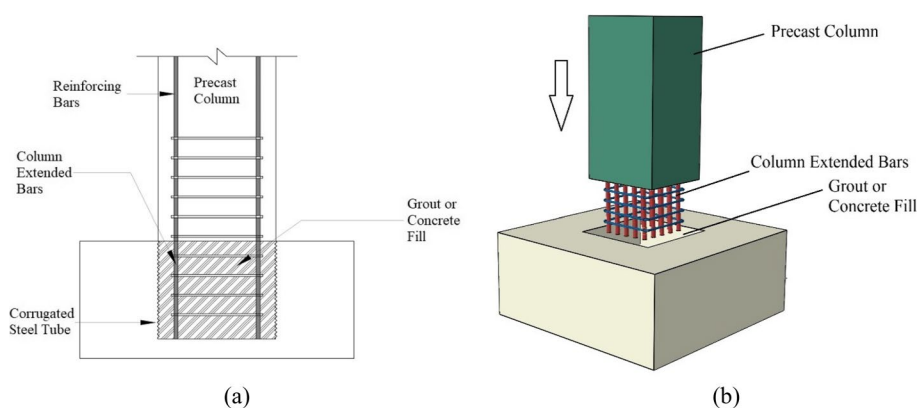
Pocket connection: a Section b 3D view (© Munzer Hassan, ETS)
